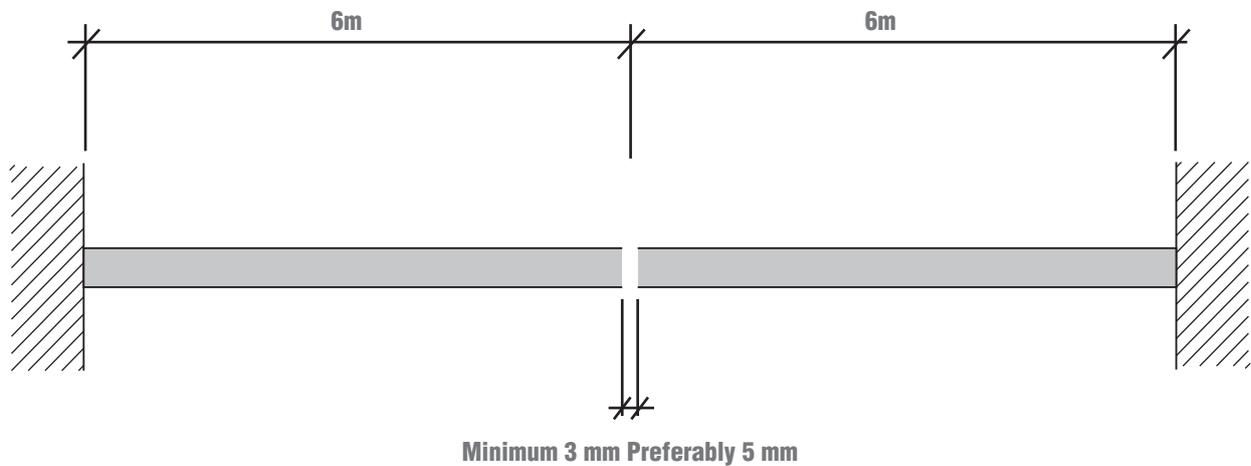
Welding of two box sheet metal profiles with 6 m length
